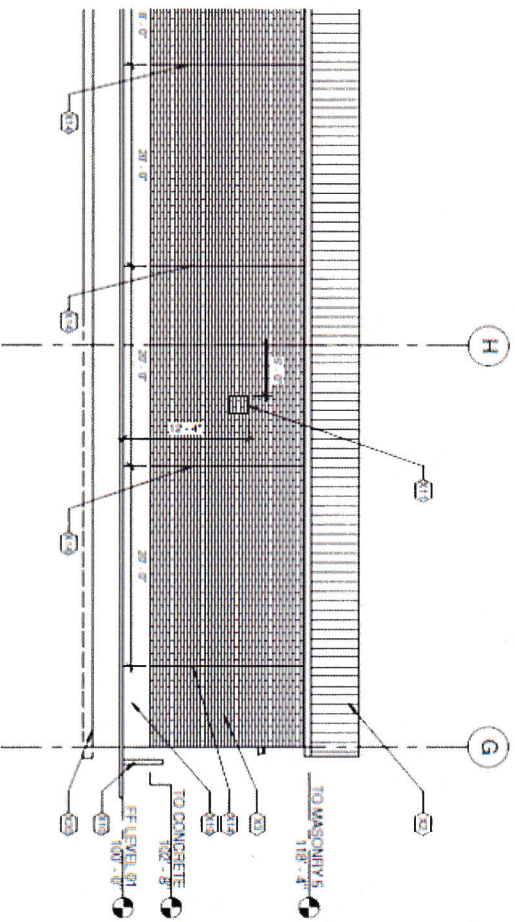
Exhibit F - Architectural Elevations of the Mechanical Dewatering & Solids Storage buildings
